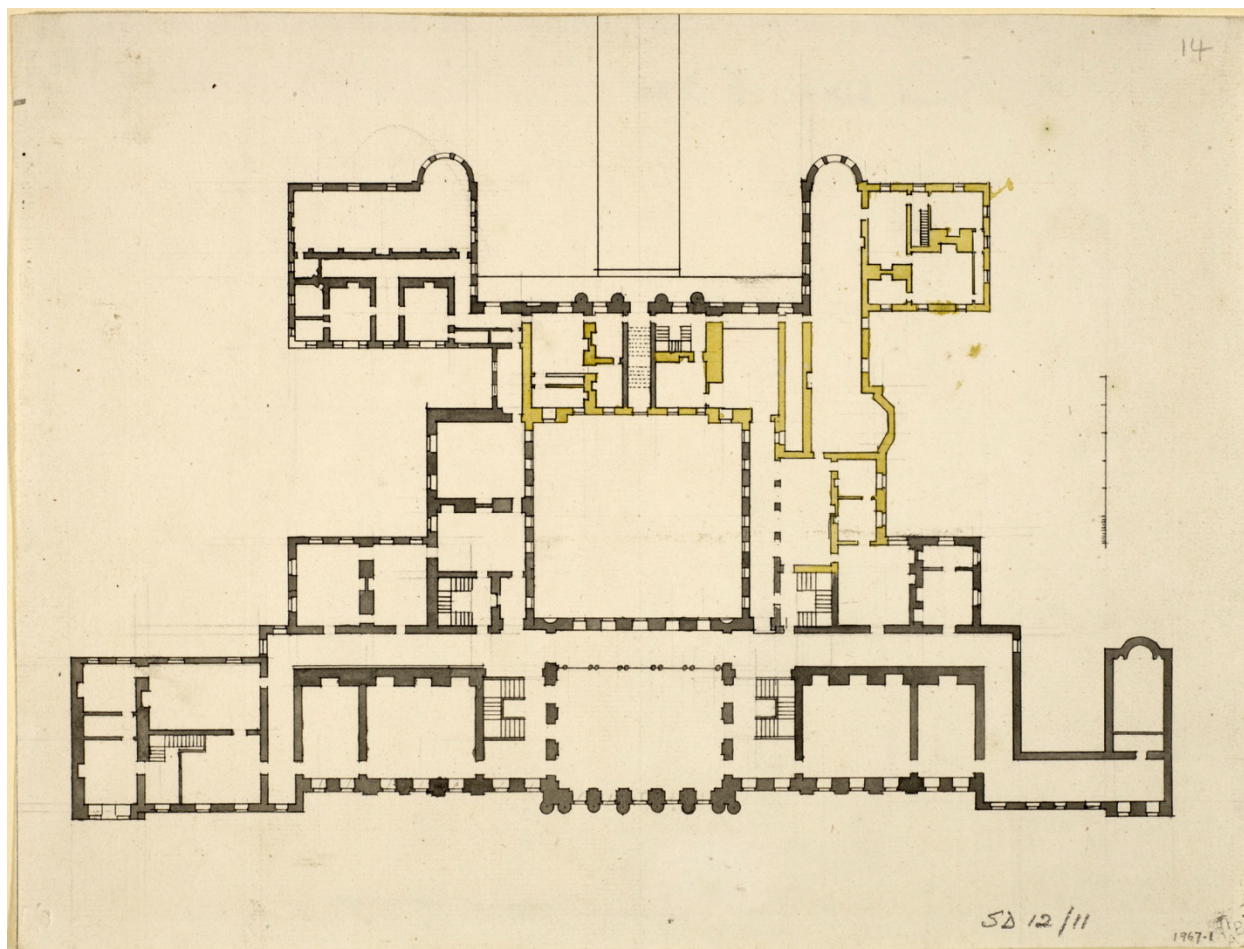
Design for remodeling Wentworth Woodhouse, plan of the ground floor, William Thornton (?), previously attributed to James Gibbs, c. 1711. Royal Institute of British Architects Collections: SD 12/11. Royal Institute of British Architects.
